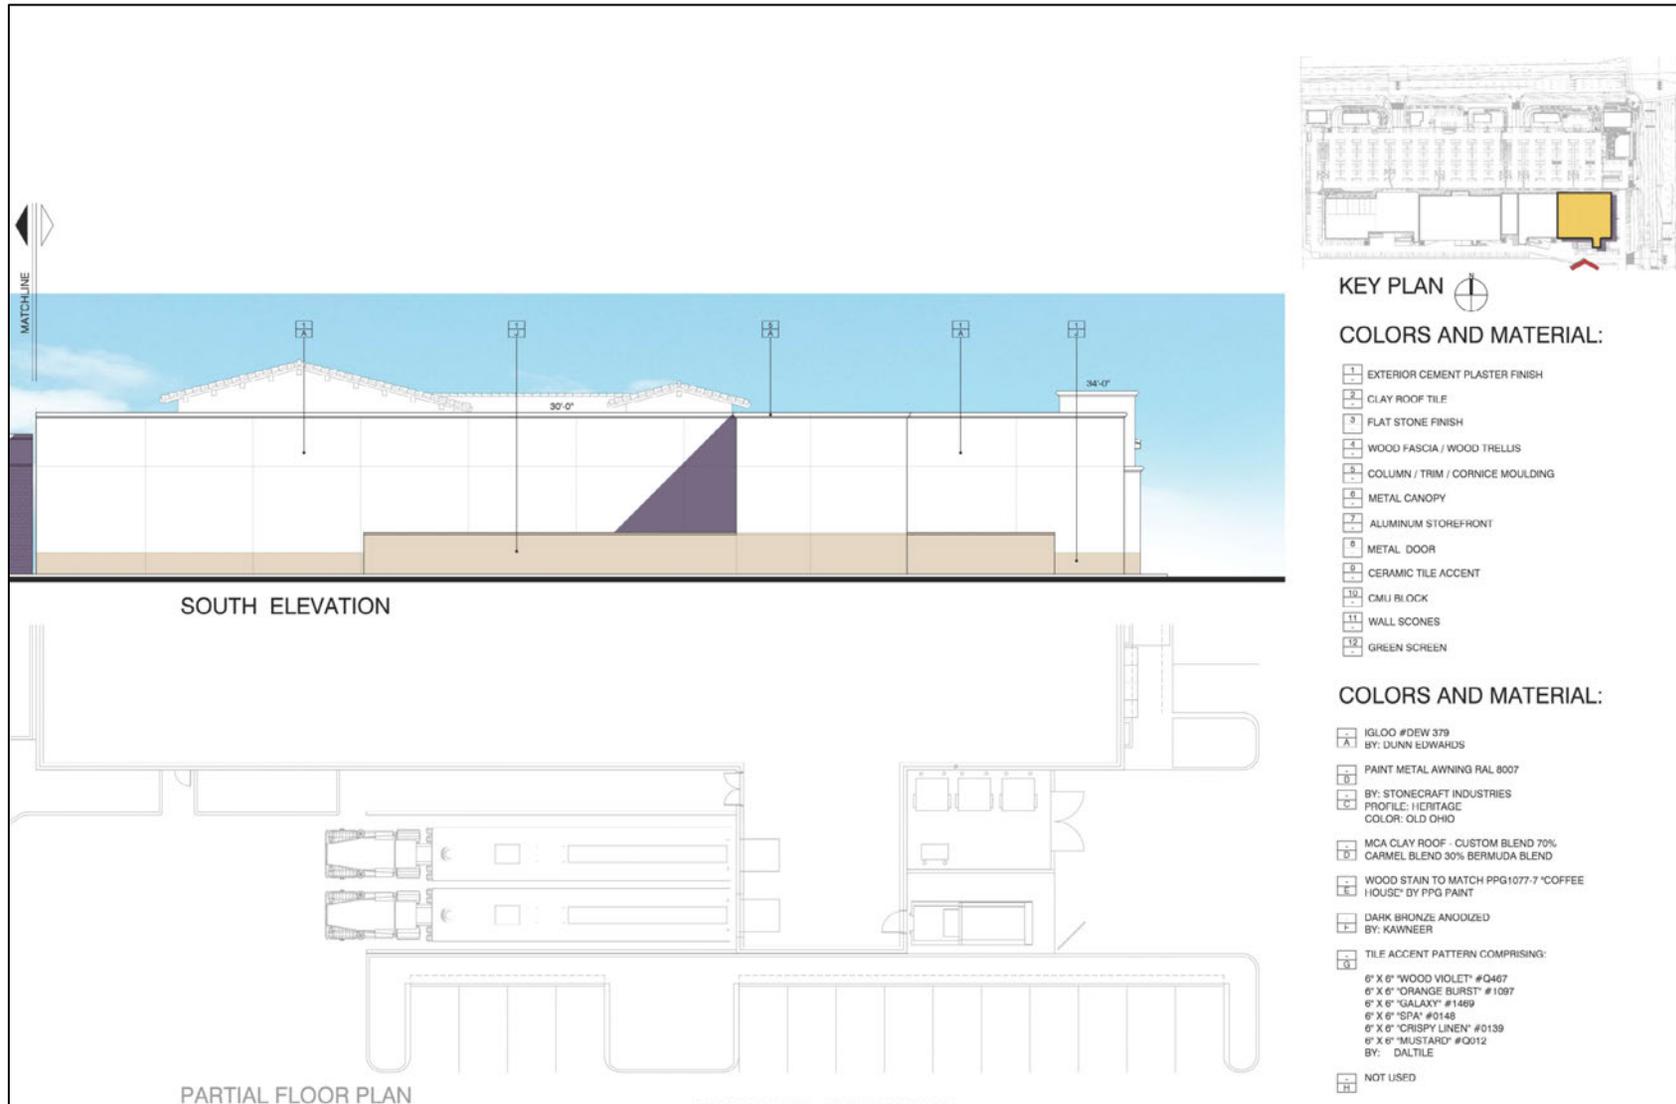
Exhibit D: ELEVATIONS CONTINUED – MAJOR BUILDINGS 4 & 5
